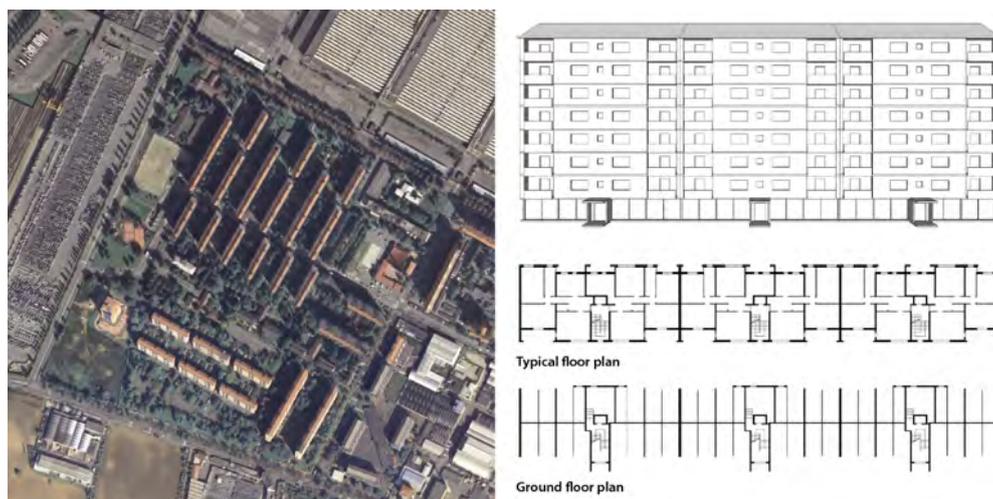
Quartiere Mirafiori Sud: (left) aerial view and (right) sample building façade and floor plans (Source: Authors, 2016).
